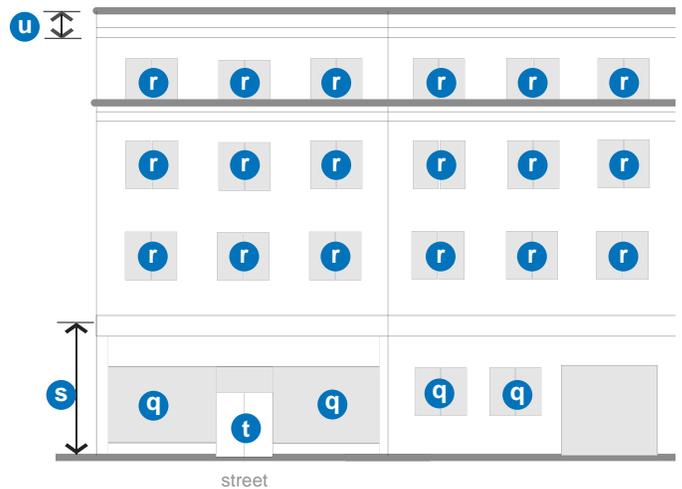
(3) Mid Scale Shop Building: Street Facade Requirements
